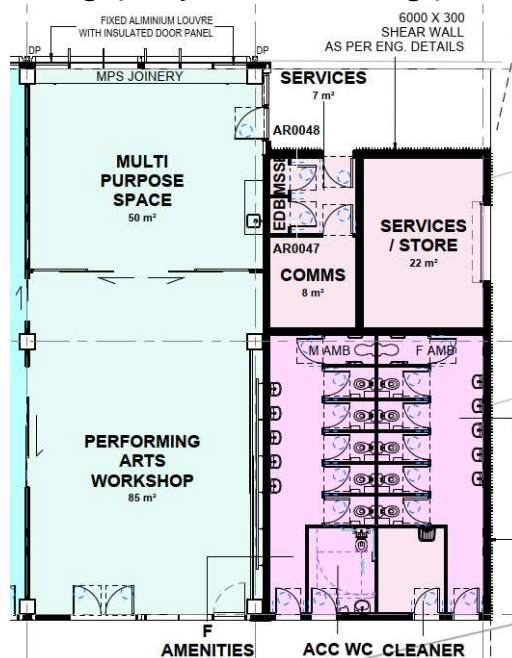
Building A Amenity Block typically to be stacked from GF to L2 (Source: EJE Architecture)
